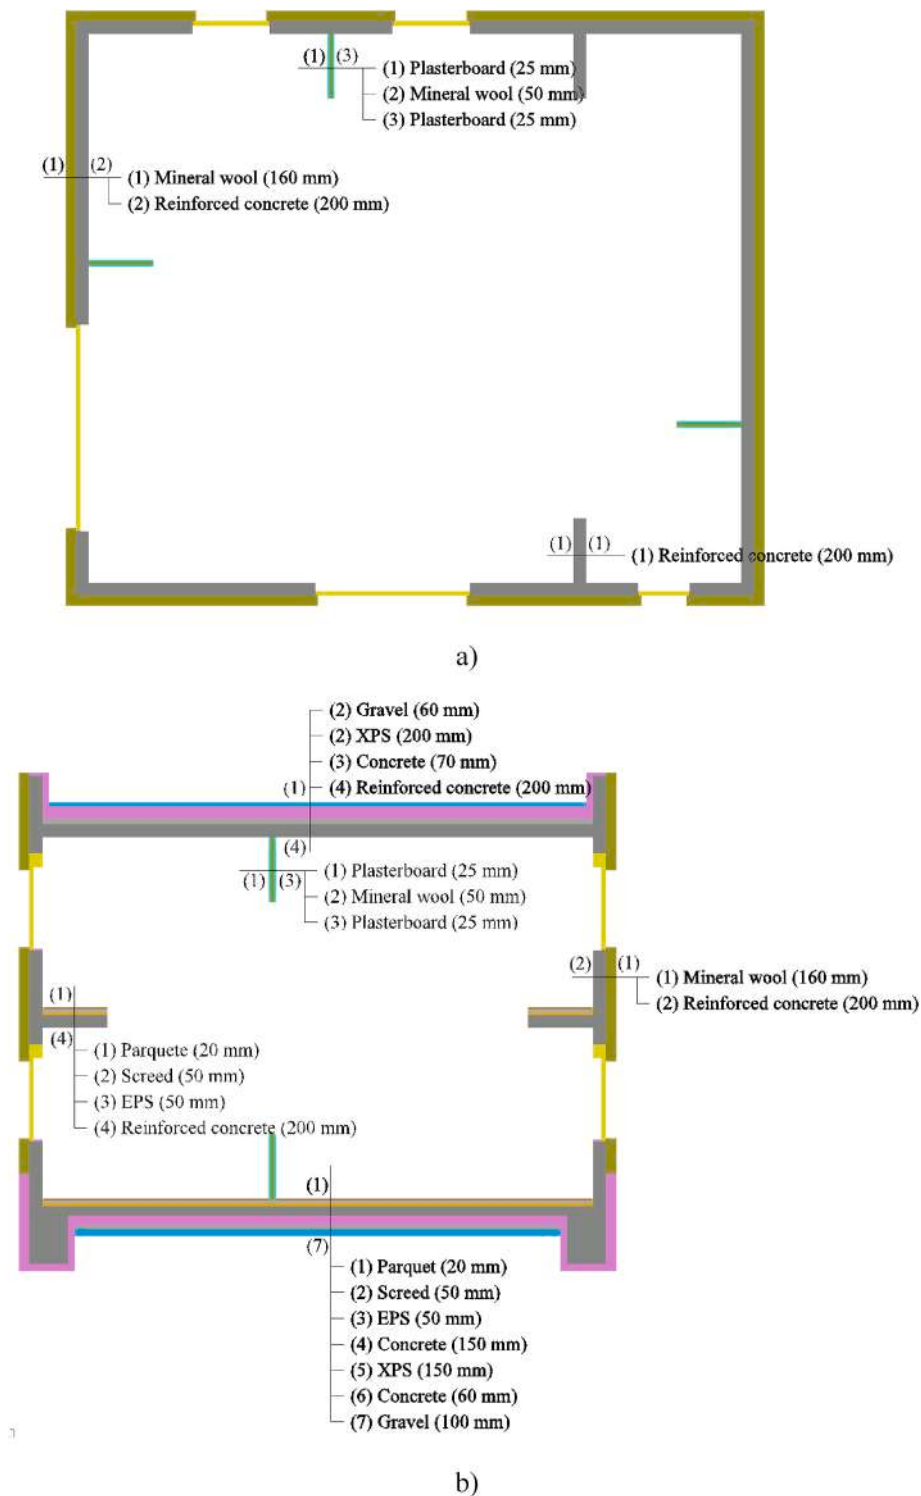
Multi-section building's element thicknesses; a) horizontal, b) vertical.
